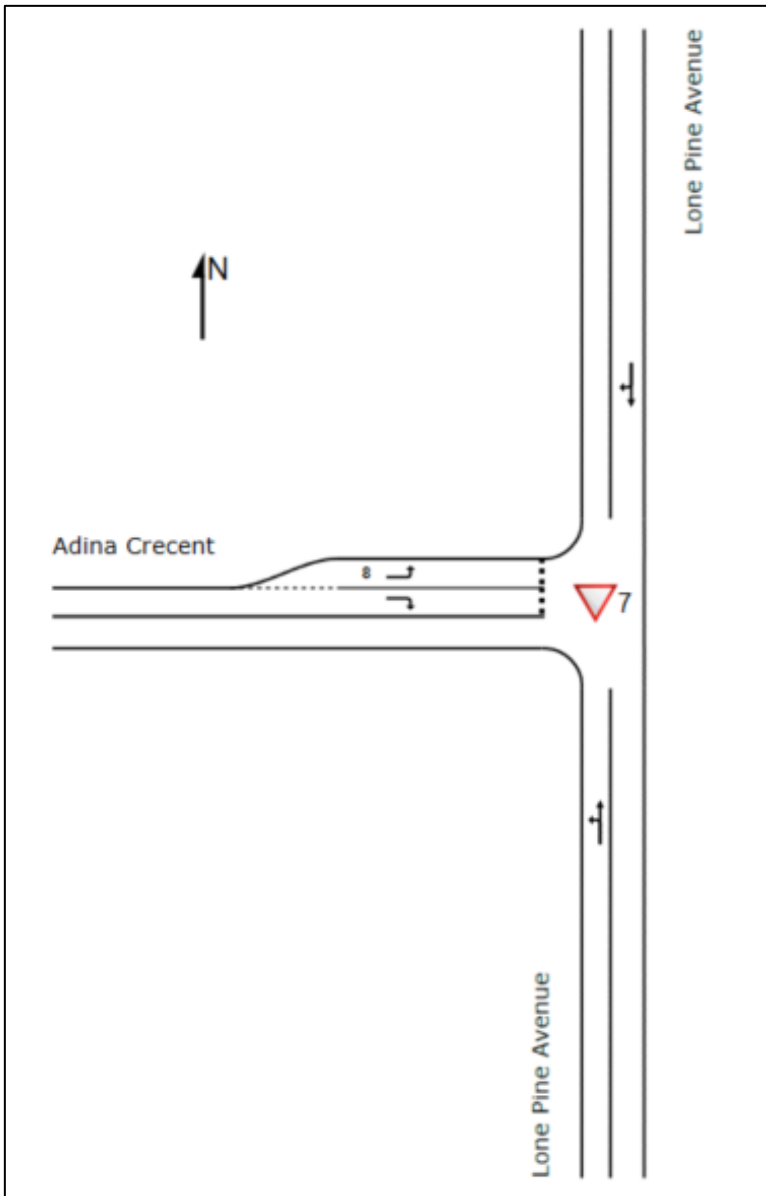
Lone Pine Avenue / Adina Crescent SIDRA Layout
